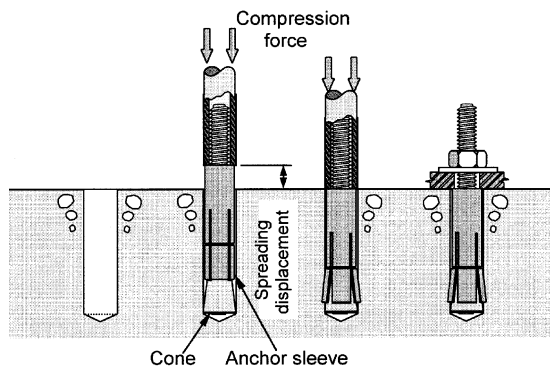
(d)(continued)—Type 4 undercut anchor. Displacement-controlled anchor that cuts its own undercut while being set by hammering sleeve over cone.
